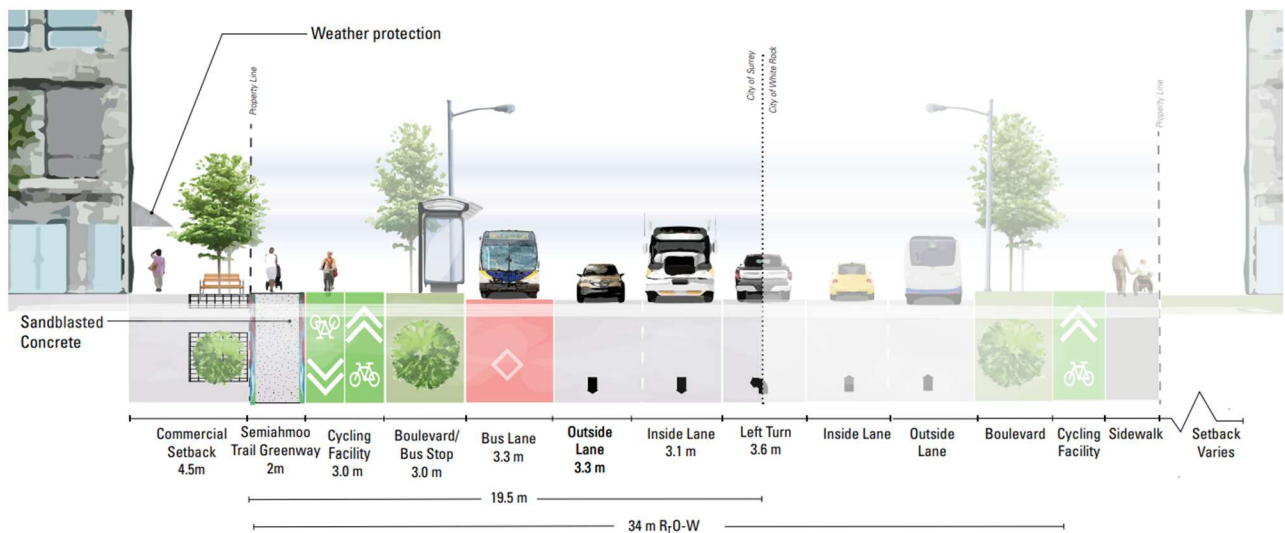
16 Avenue between Martin Drive and 152 Street Cross Section
